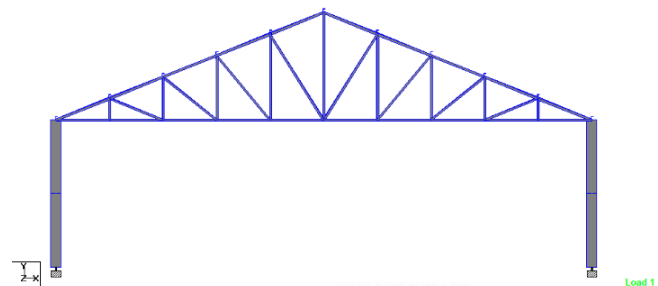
Staad-Pro Generated frame Elevation of Conventional steel building
